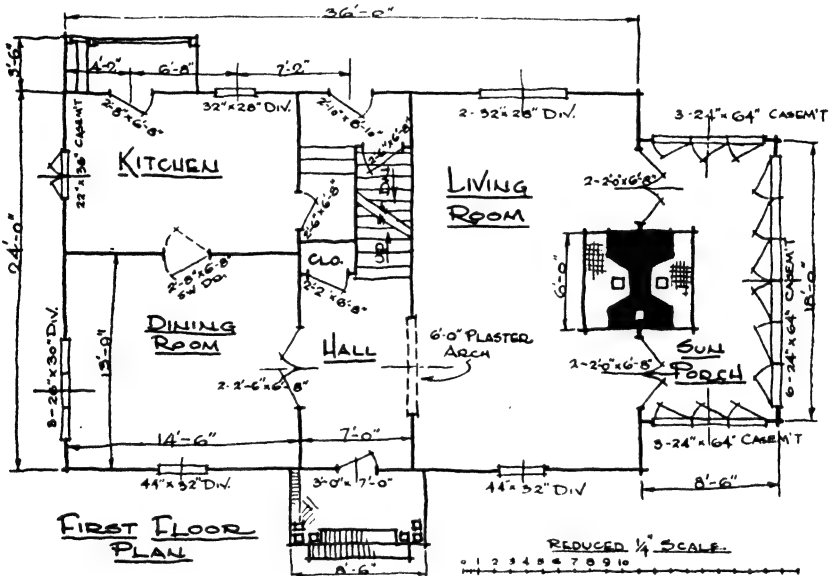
Rough Sketch of a First Floor Plan of a Colonial House
